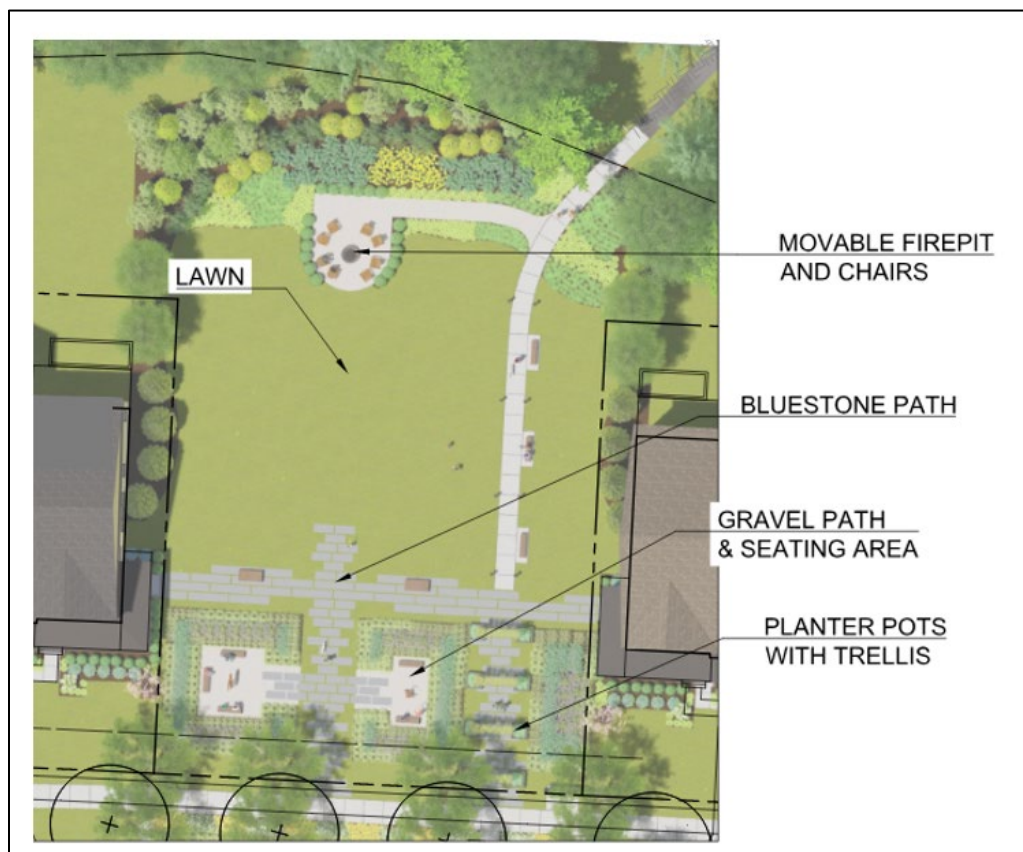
Illustrative Plan of Proposed Open Space along Greyswood Road
